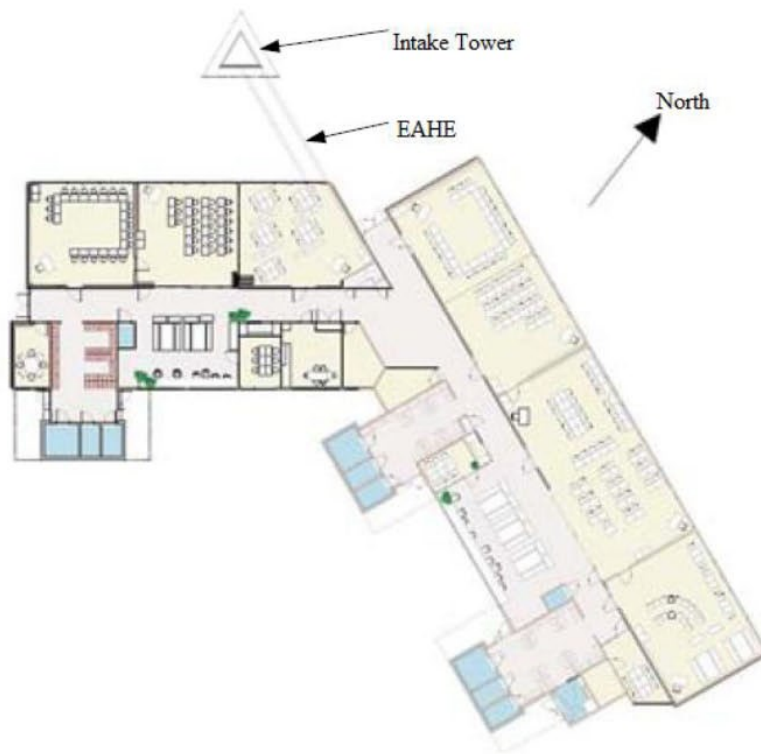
Mediå school layout (Paolo and Roberto, 2009).
